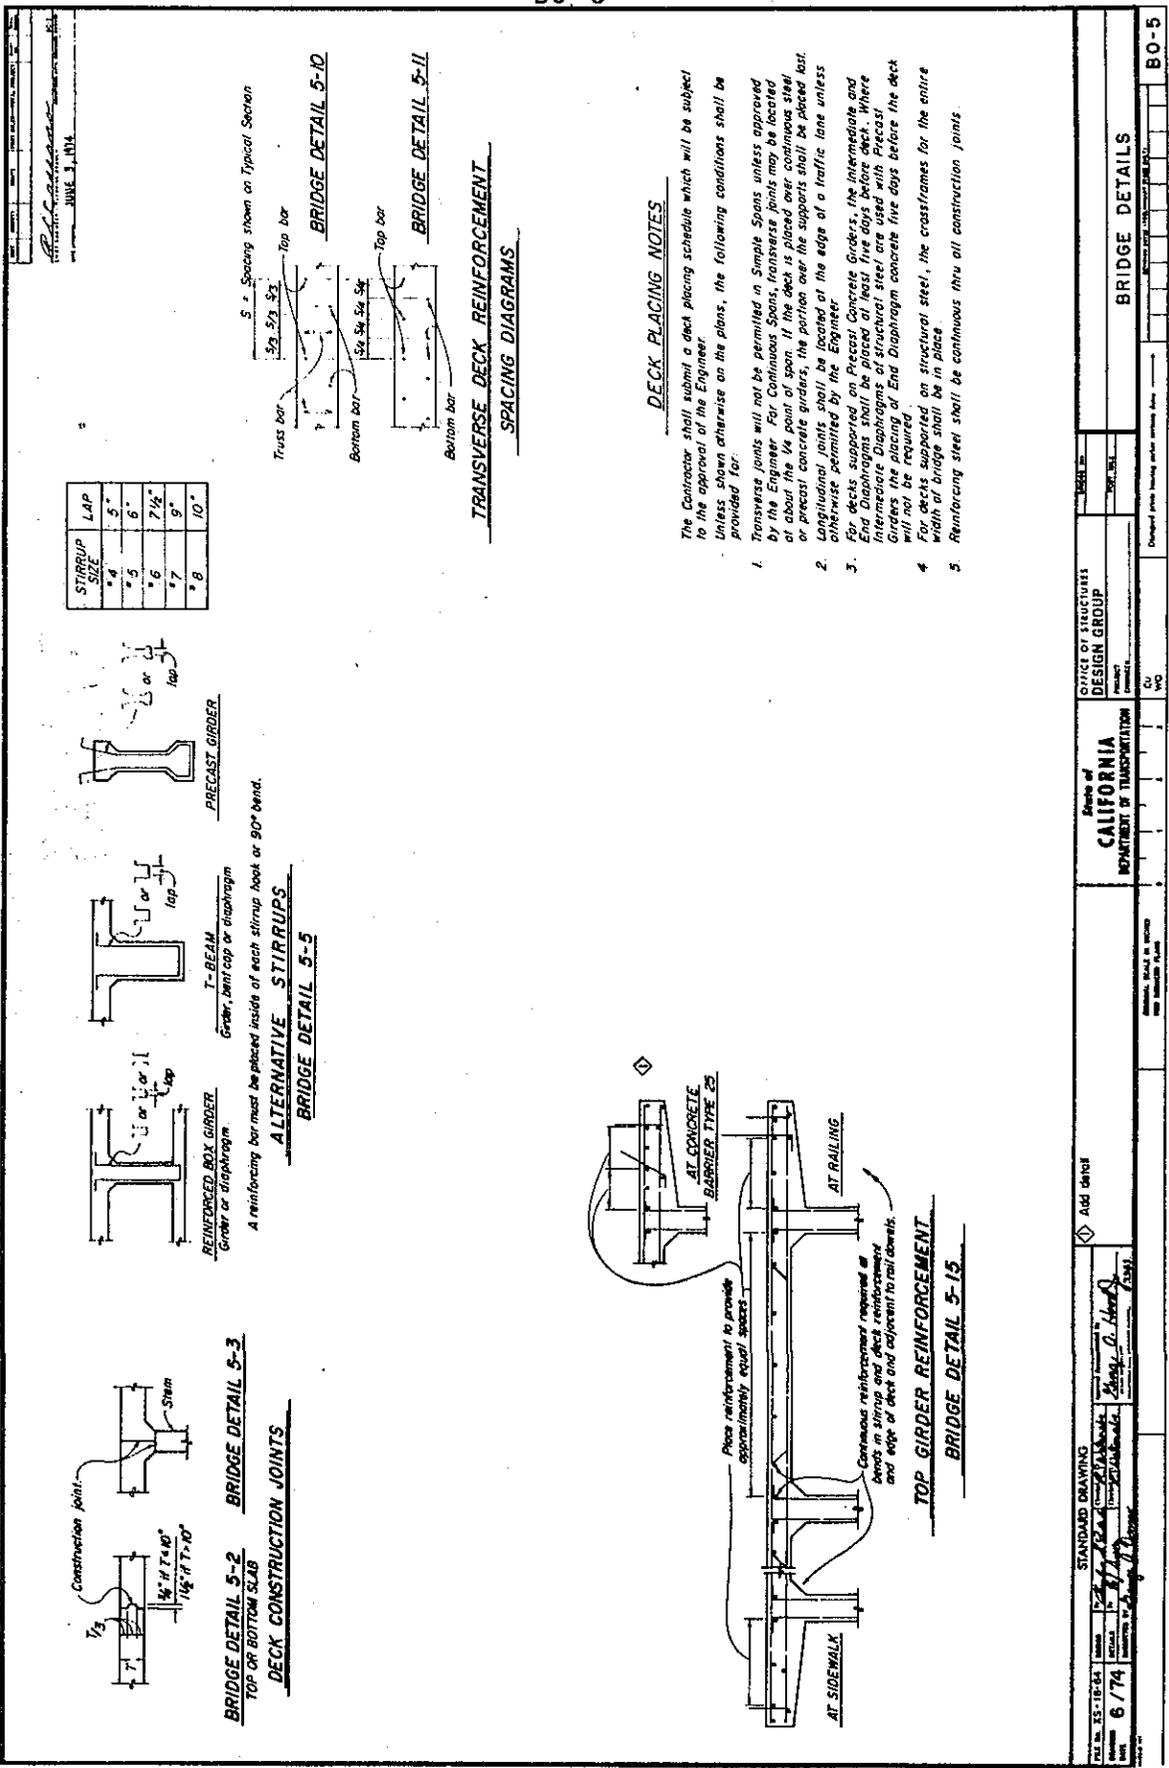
Position of reinforcing steel in a bridge deck overhang beneath a Type 25 Concrete Bridge Barrier.
